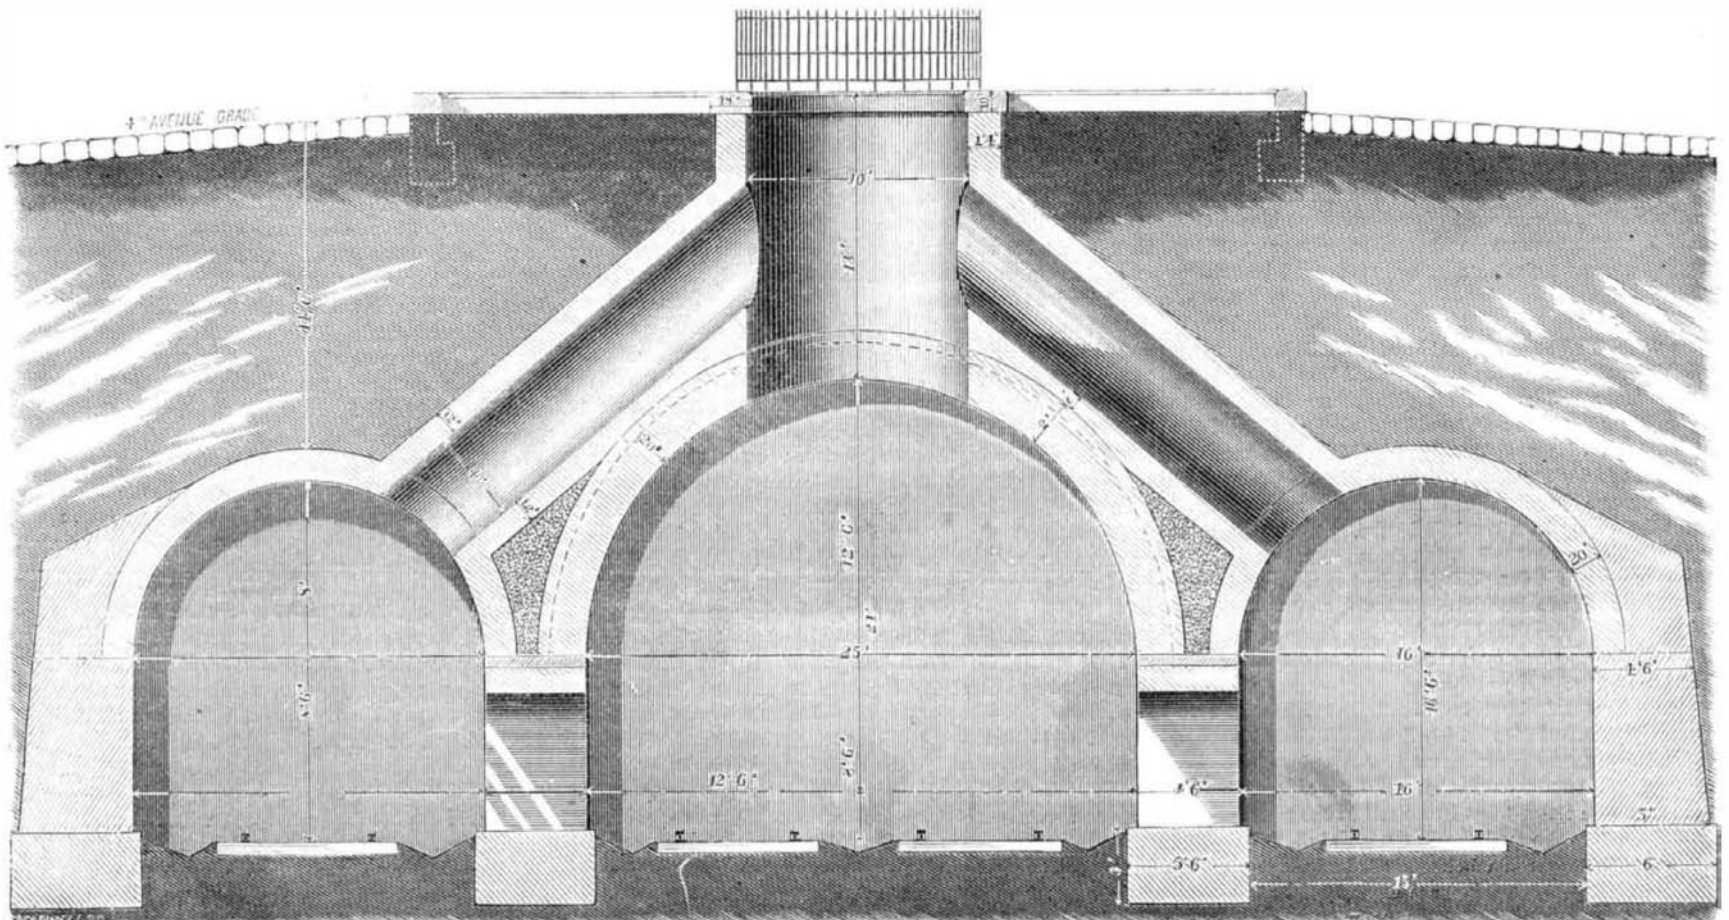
THE UNDERGROUND RAILWAY IN NEW YORK.—CROSS SECTIONS OF THE MASONRY TUNNELS AND VENTILATING SHAFTS.
